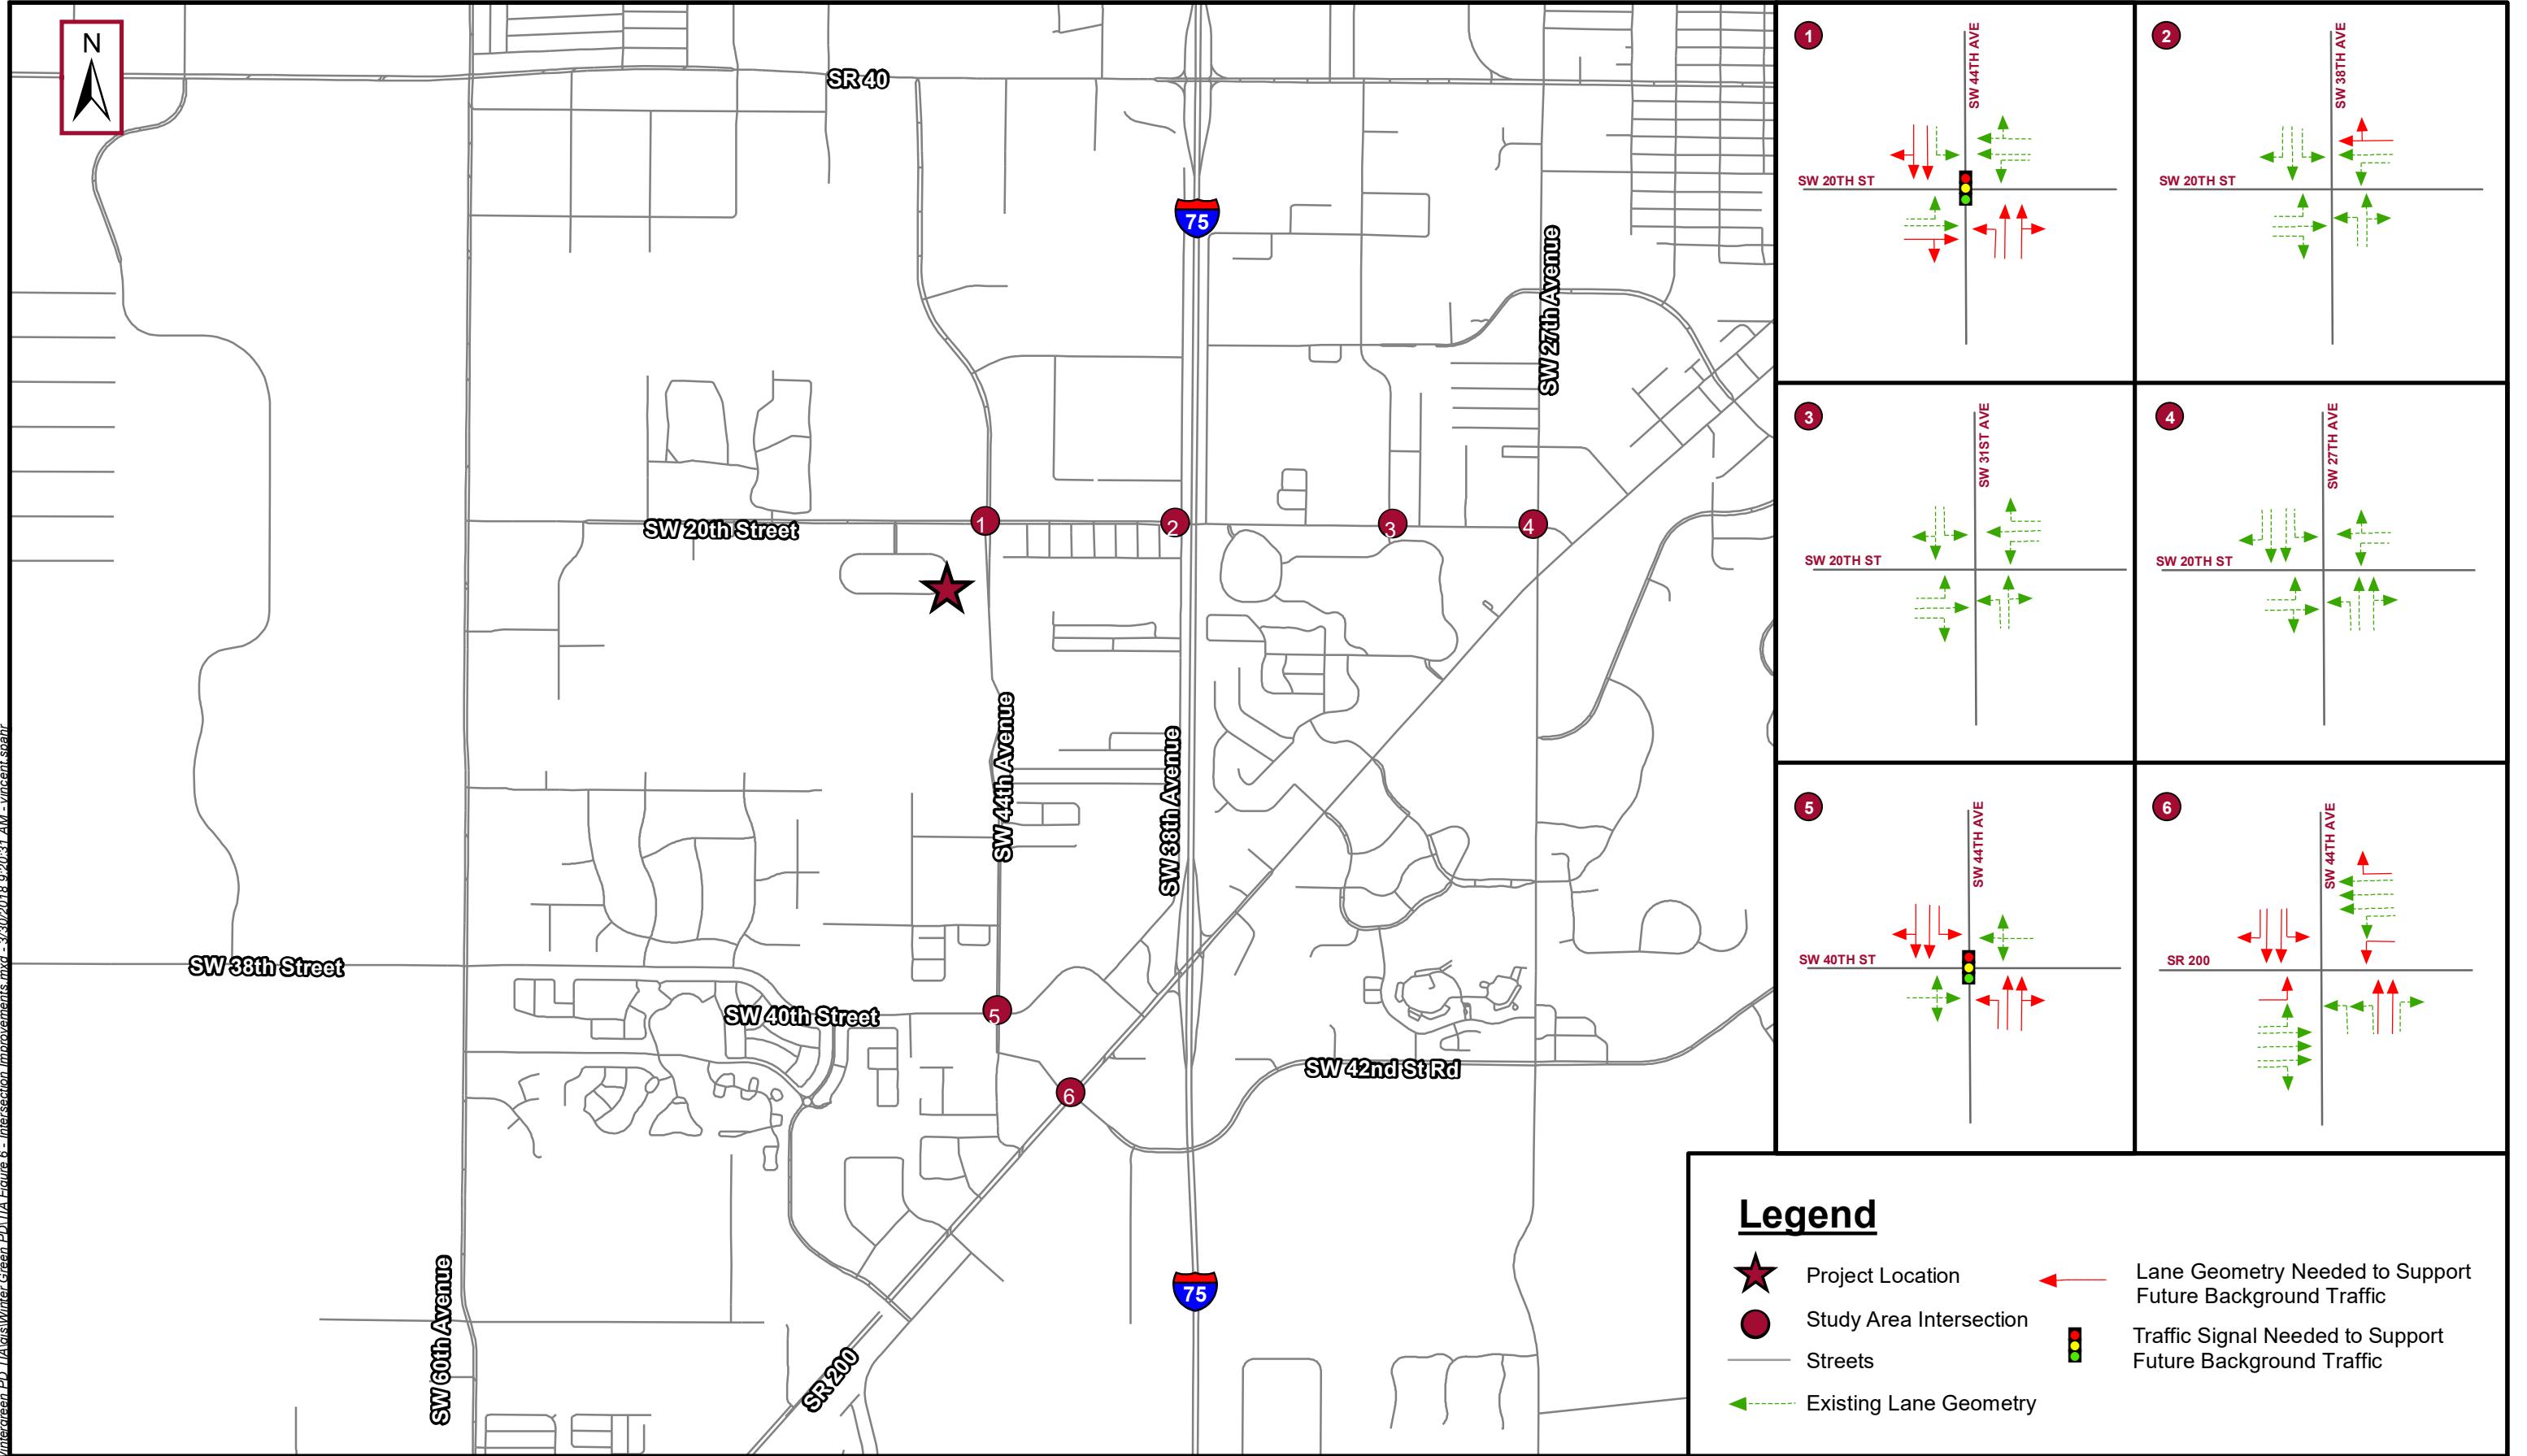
INTERSECTION IMPROVEMENT DETAILS
